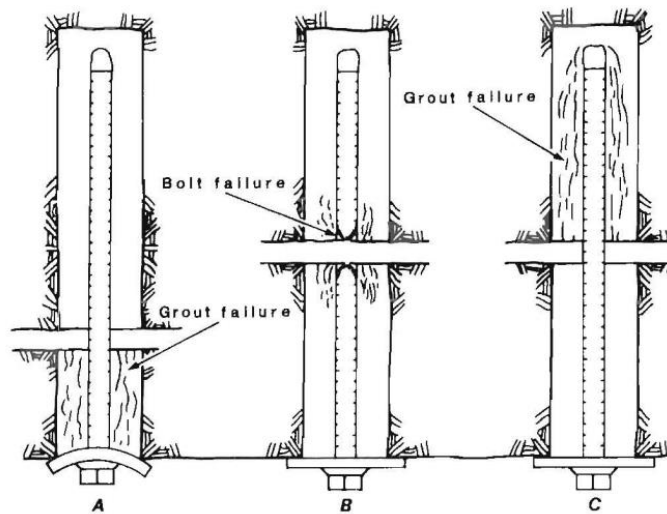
Failure modes of fully grouted rock bolts: A. Grout failure; B. Bolt failure; C. Inadequate embedment length (grout column failure) (Serbousek & Signer, 1987)
